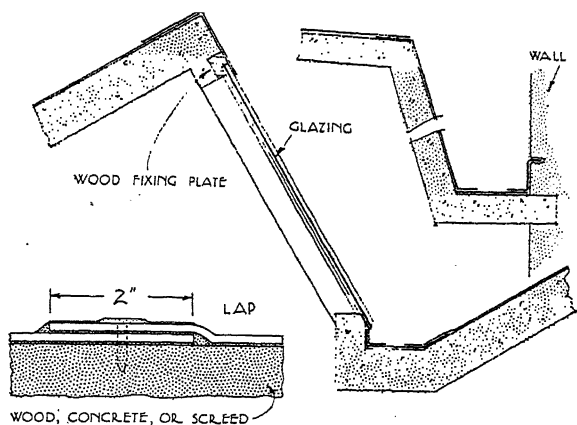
BITUMINOUS FELT ON CONCRETE ROOF.
